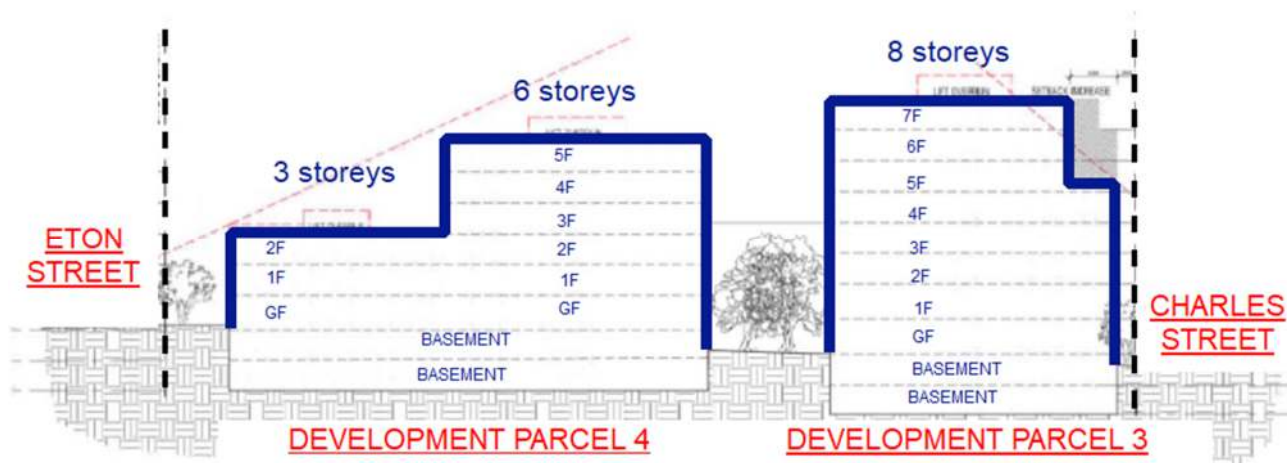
Applicant Cross Section Eton Street to Charles Street
